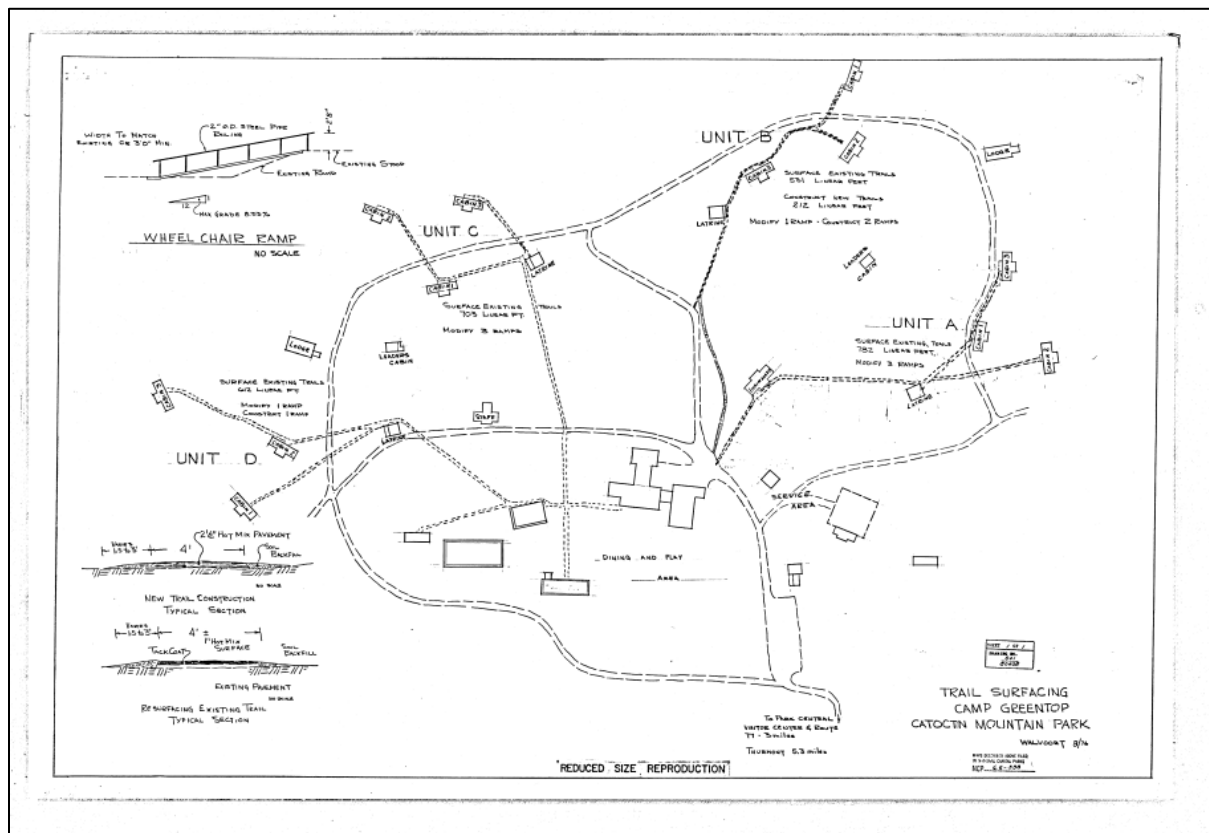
Trail surfacing plan at Camp Greentop, 1976. (NPS eTIC CATO-841-80408)
